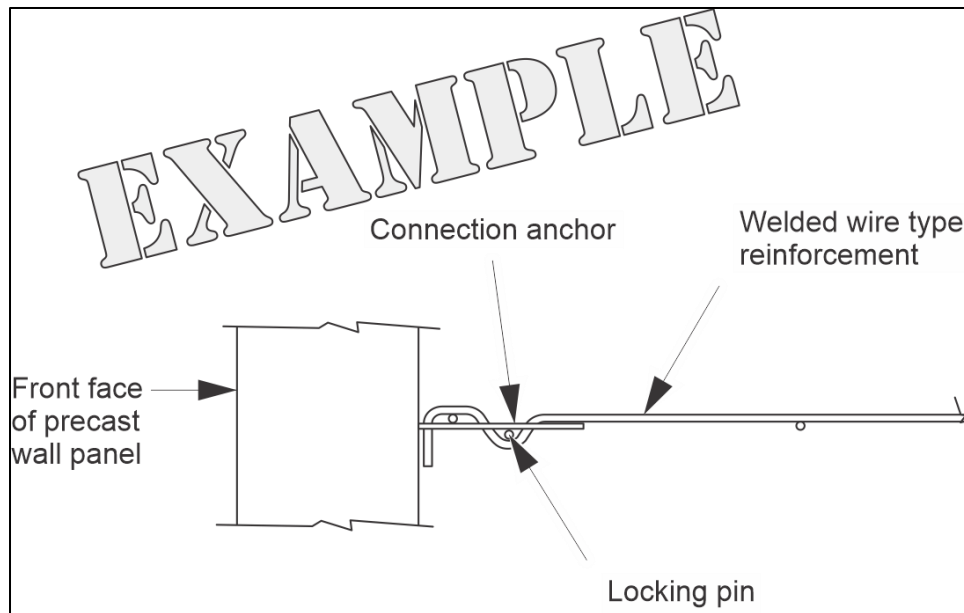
Example shop drawing for welded wire type reinforcement connection
